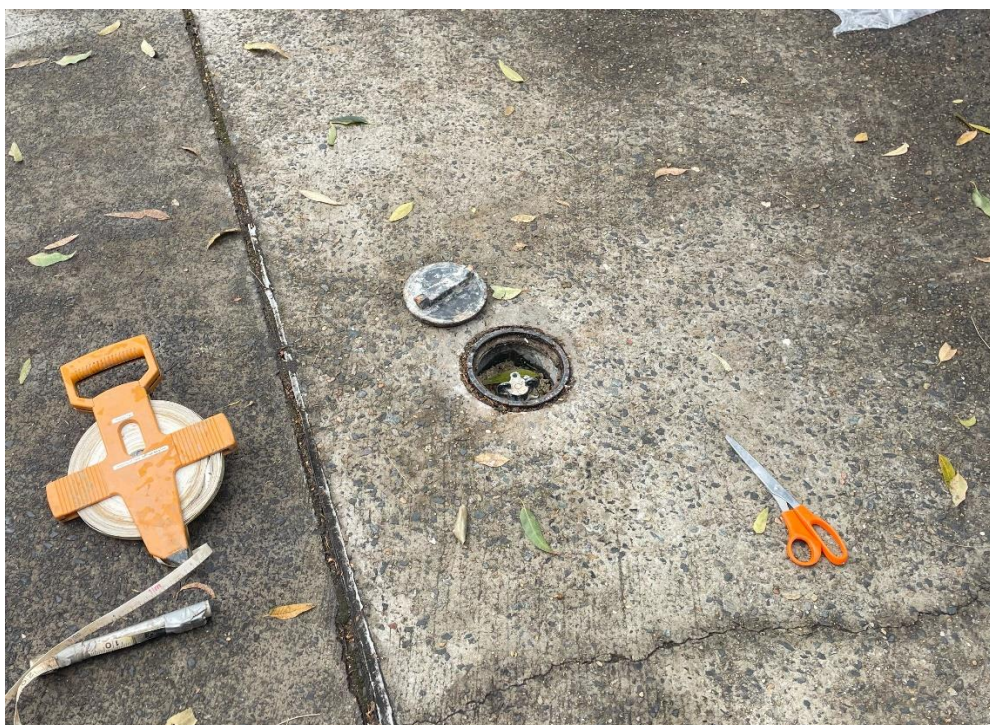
Typical constructed piezometer with a well cap (BH05b)
